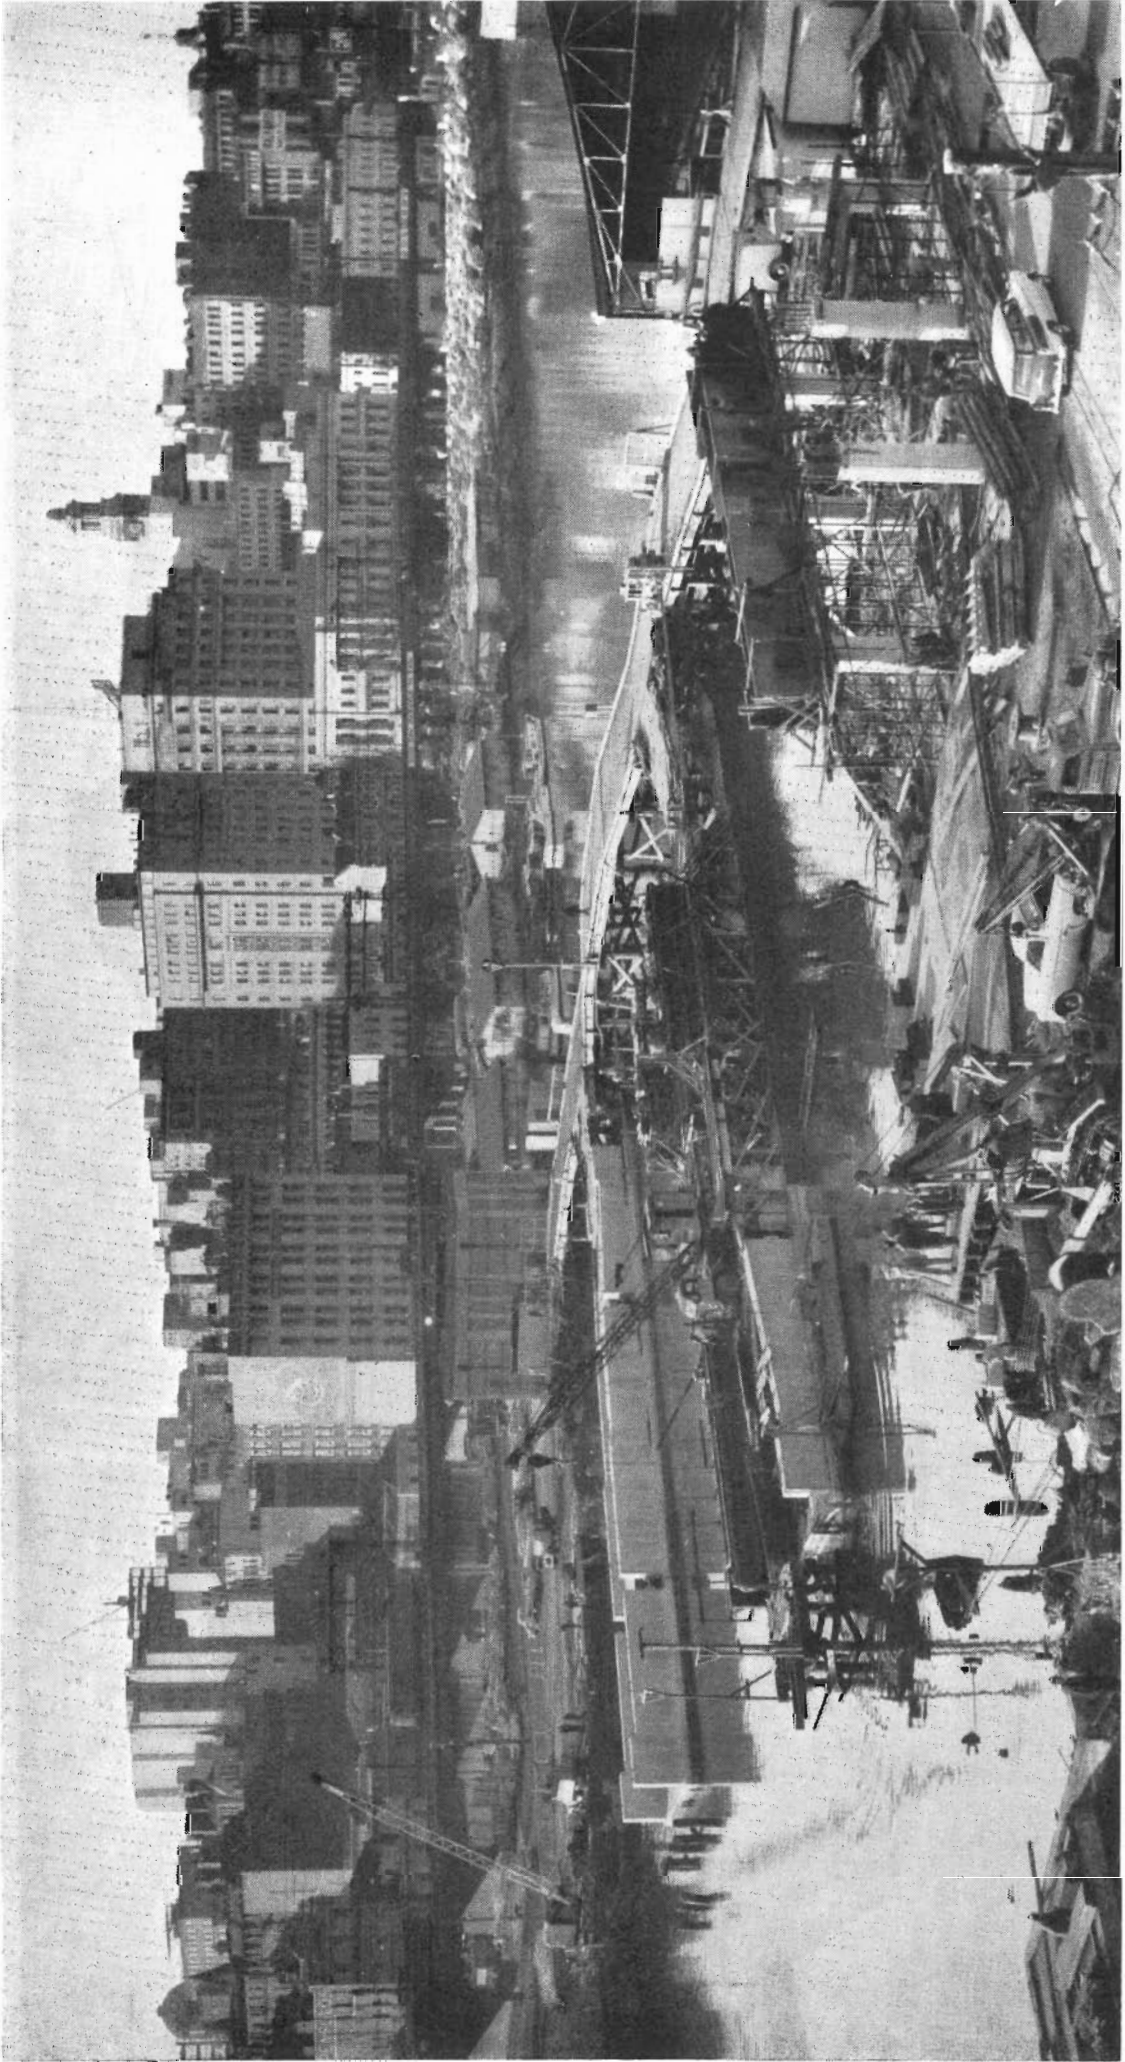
Construction of King Street Bridge over Yarra River; July, 1952.
